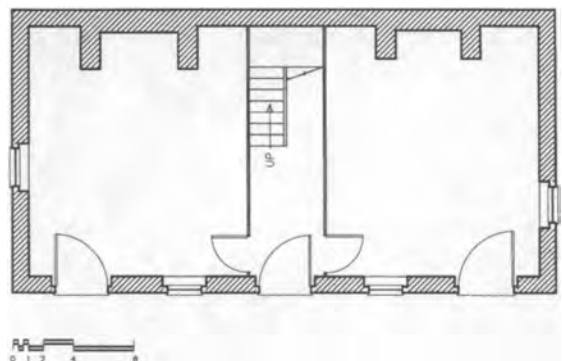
Robinson House kitchen-quarter, Judith Street—ground floor plan.
